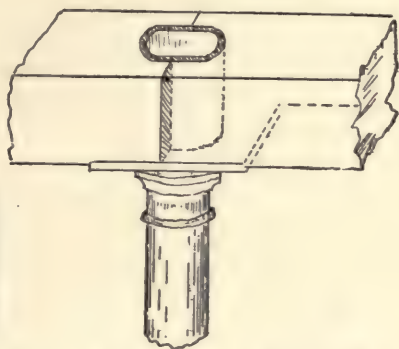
Framing of a Wooden Girder Around an Iron Column.
